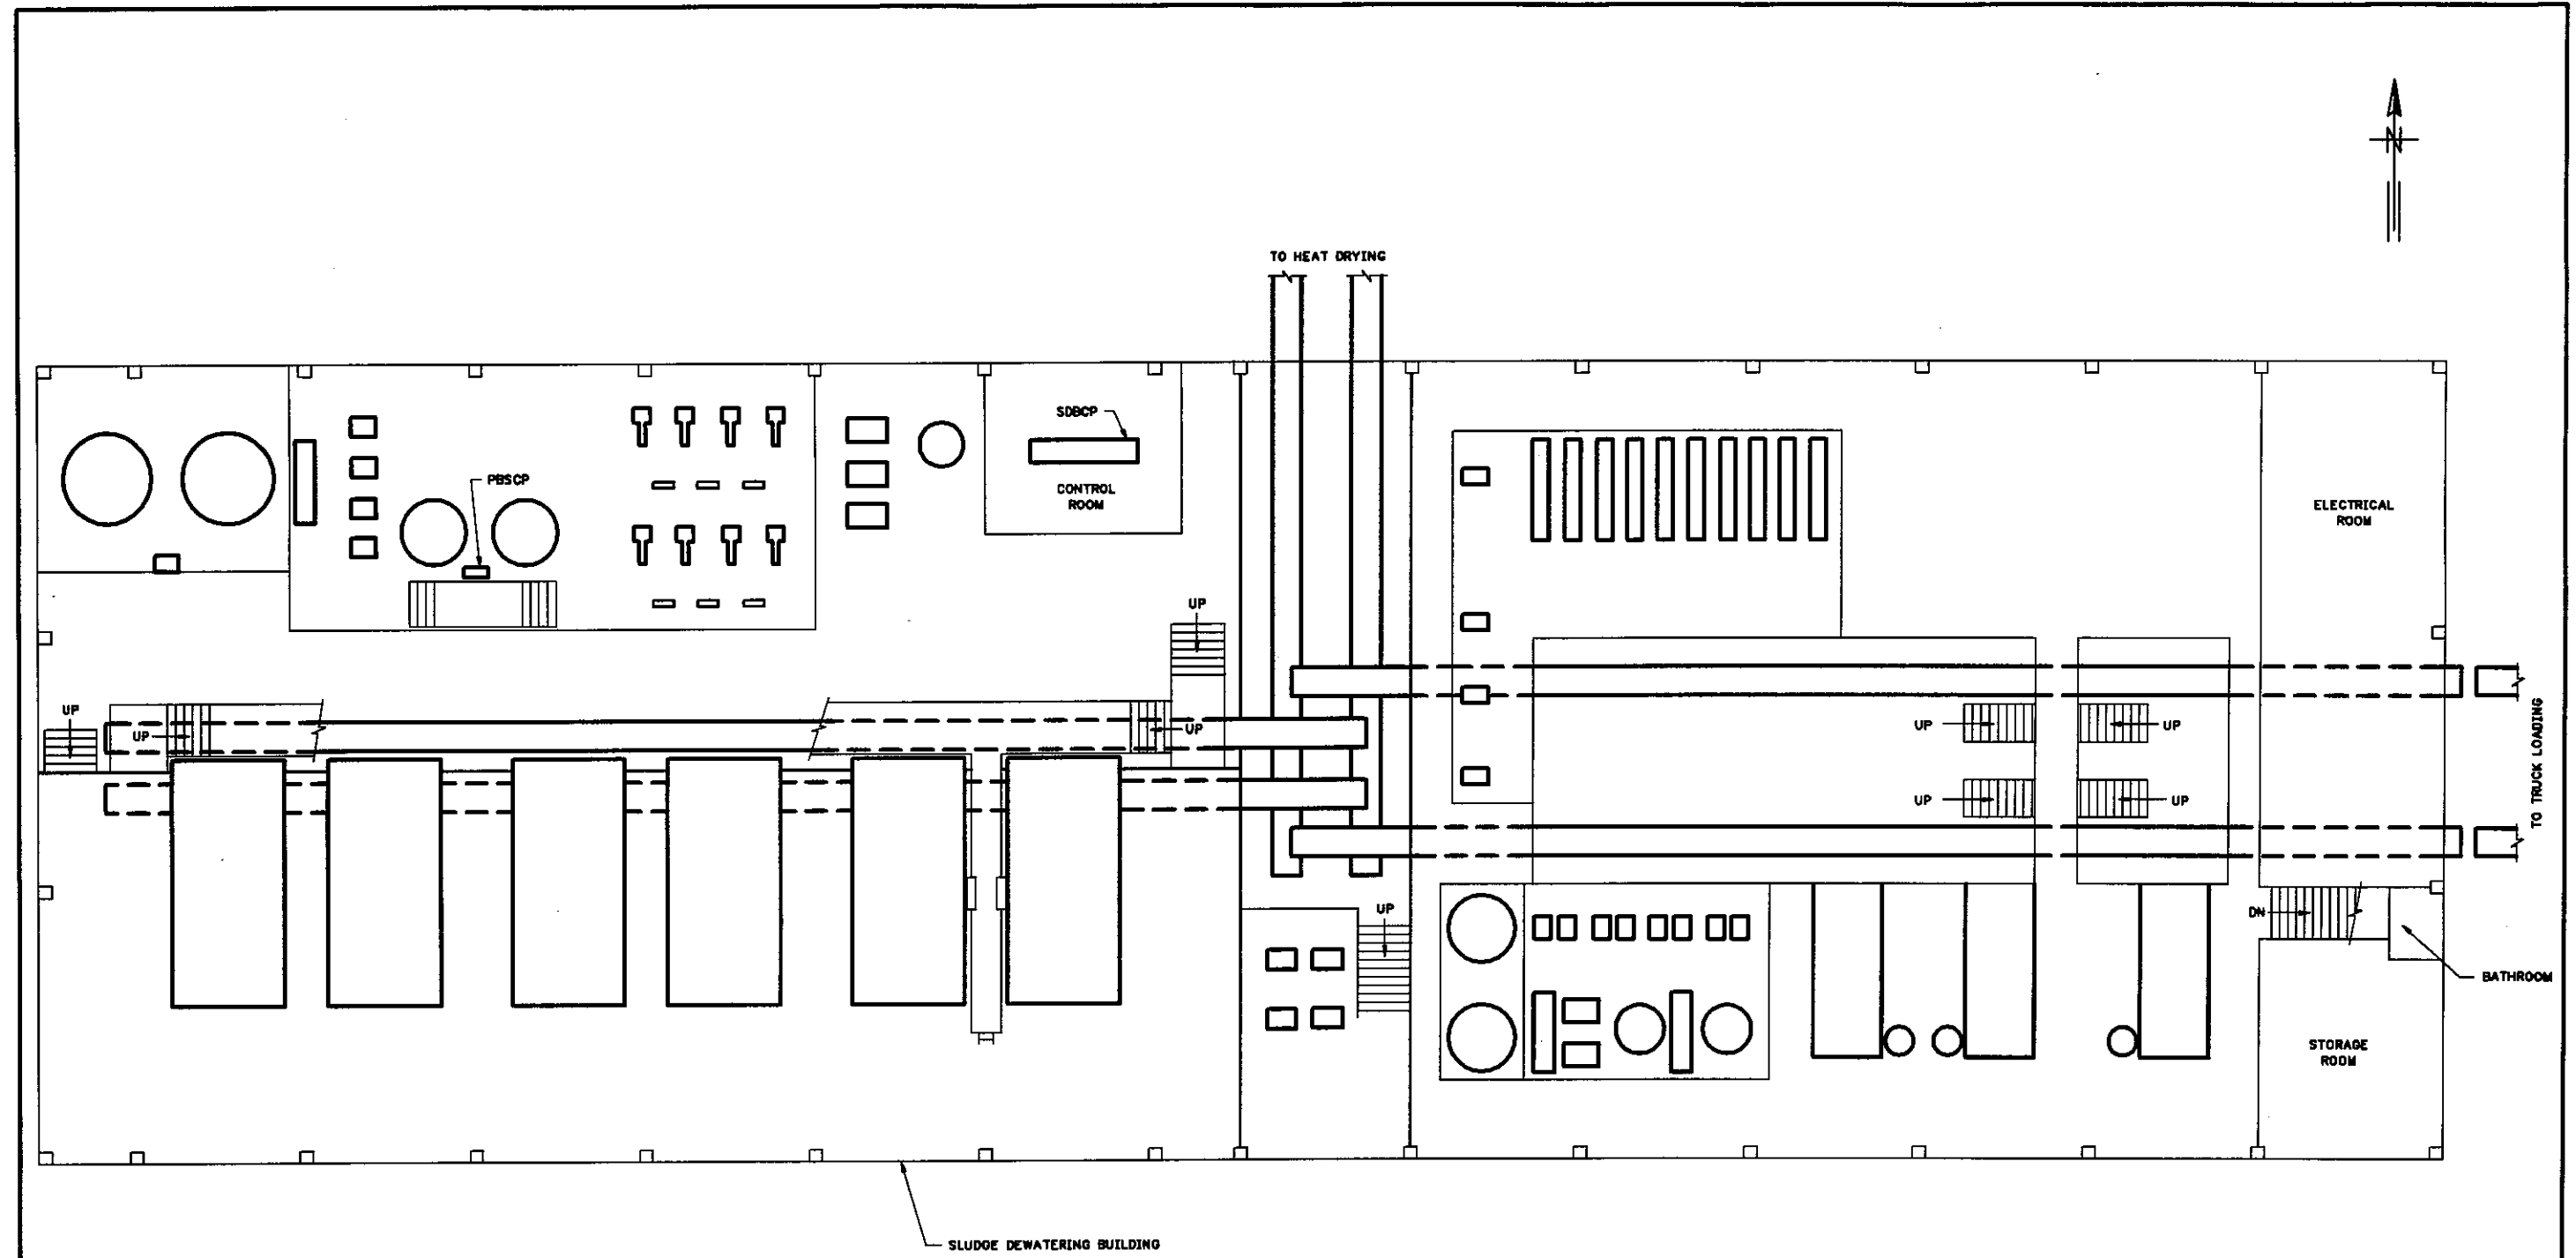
FIGURE III-SD-SDB-9 SLUDGE DEWATERING BUILDING VENTILATION DIAGRAM
